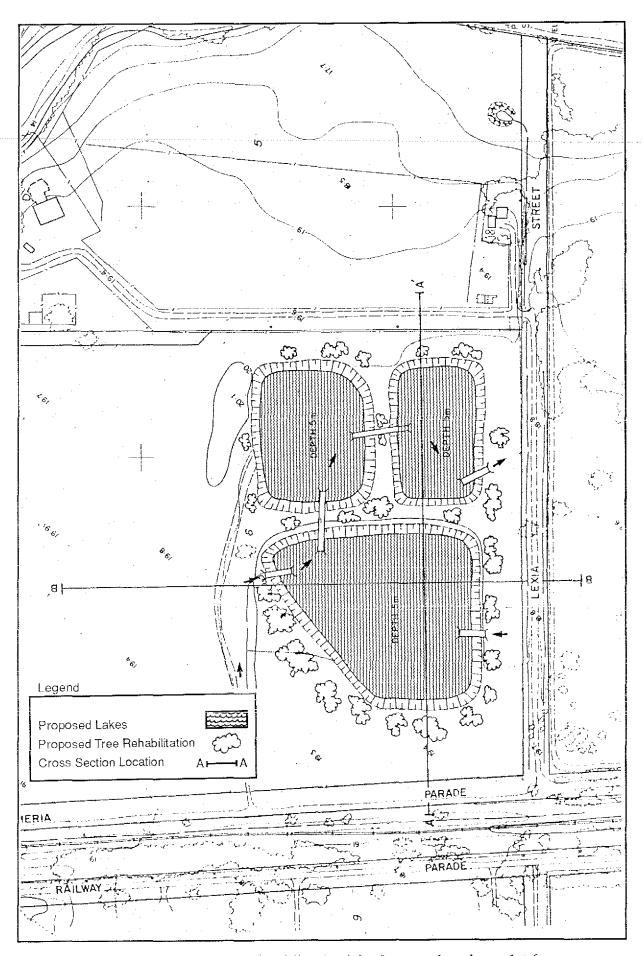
Proposed rehabilitation by Midland Brick of excavation site on lot 6.
